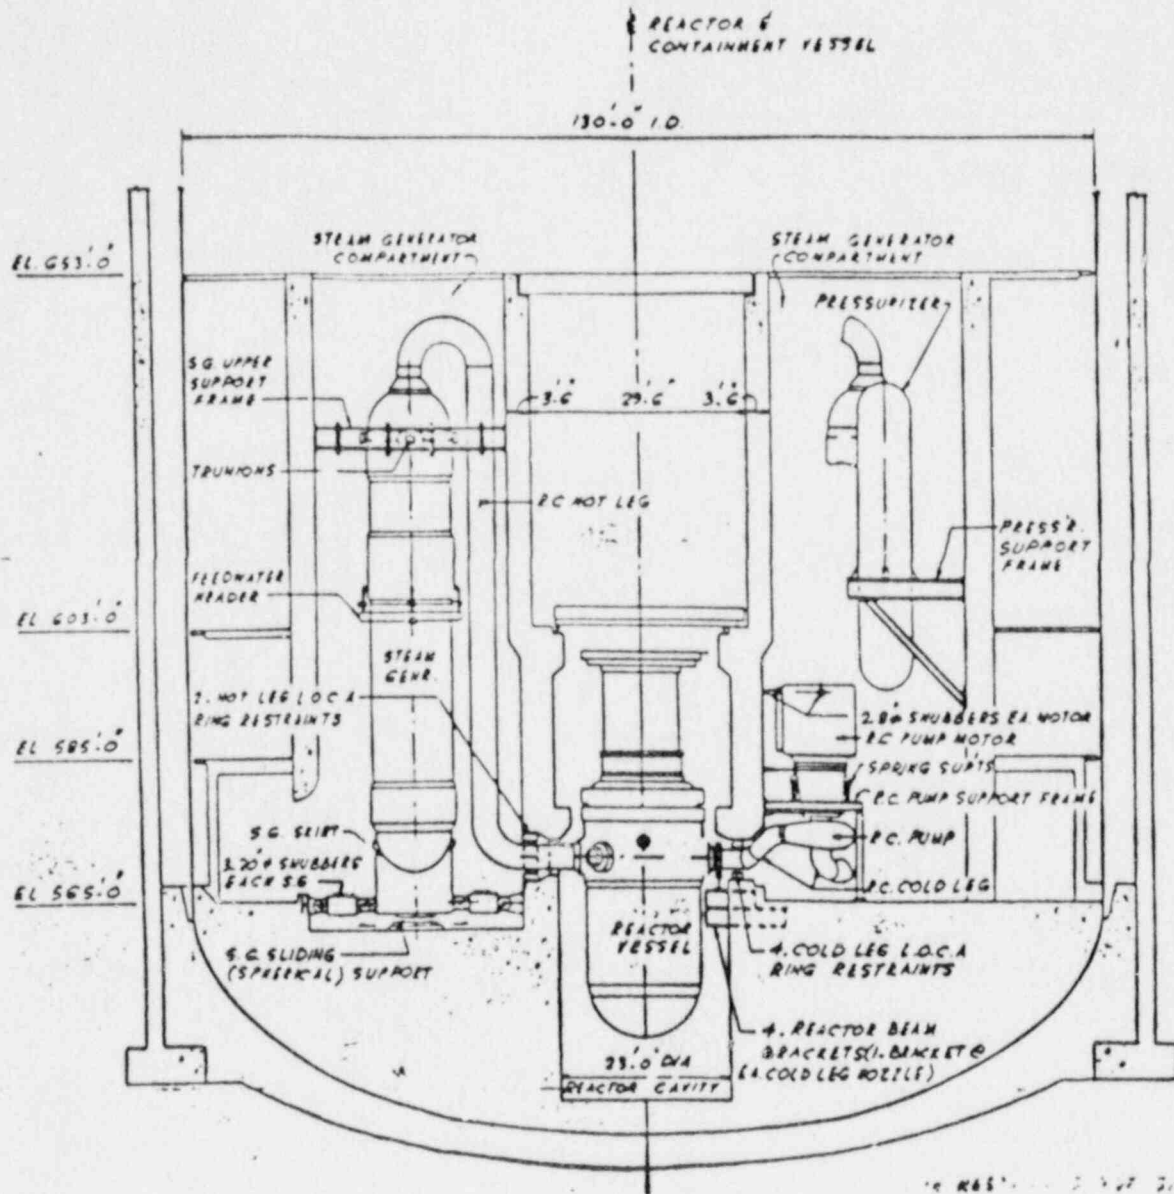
PWR vessel with short-column support resting on cantilever beam.
